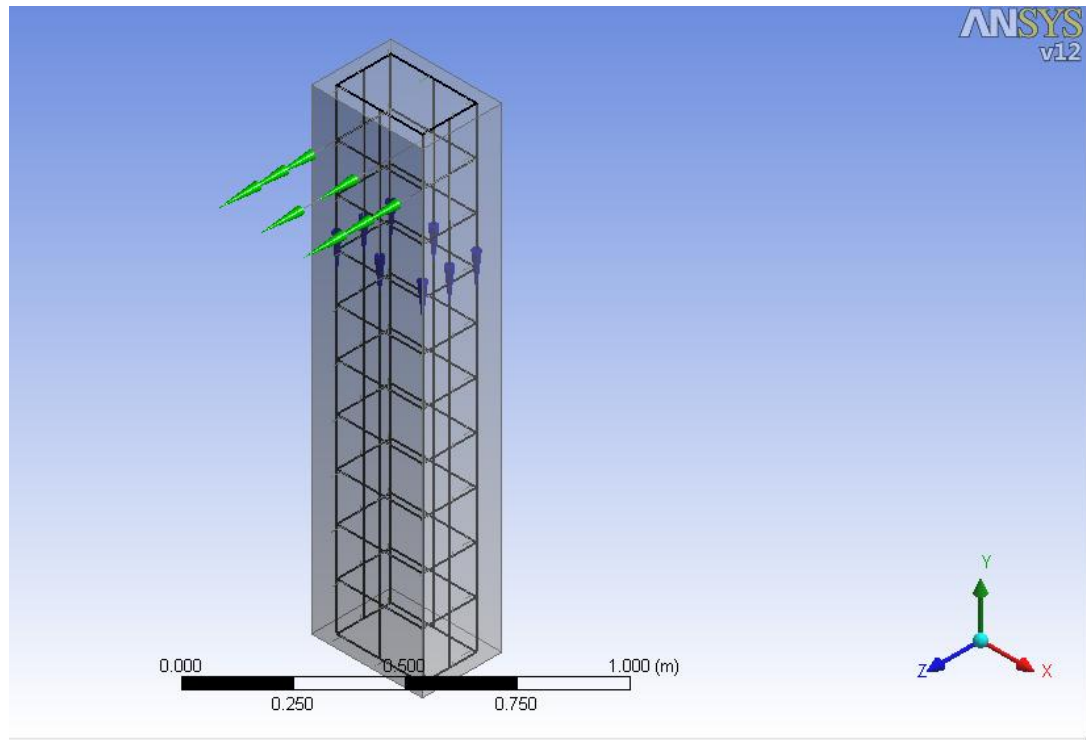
Geometric model and reinforcement detailing of Col 3007 (ISO view)
